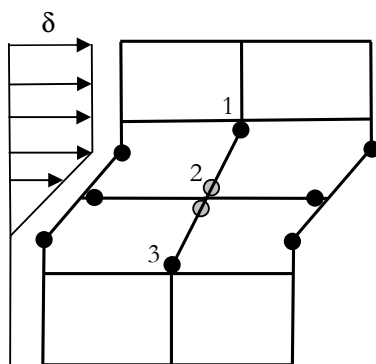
Mechanism with unavoidable hinges at intermediate locations of walls and columns
